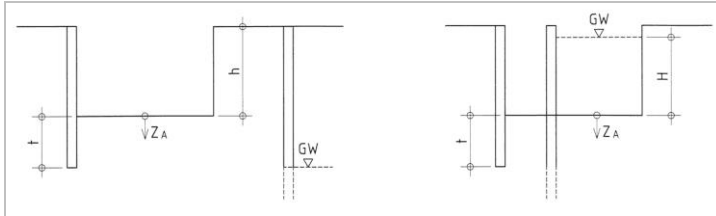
Depth of SI for deep excavations with existing ground water level above and below formation level
